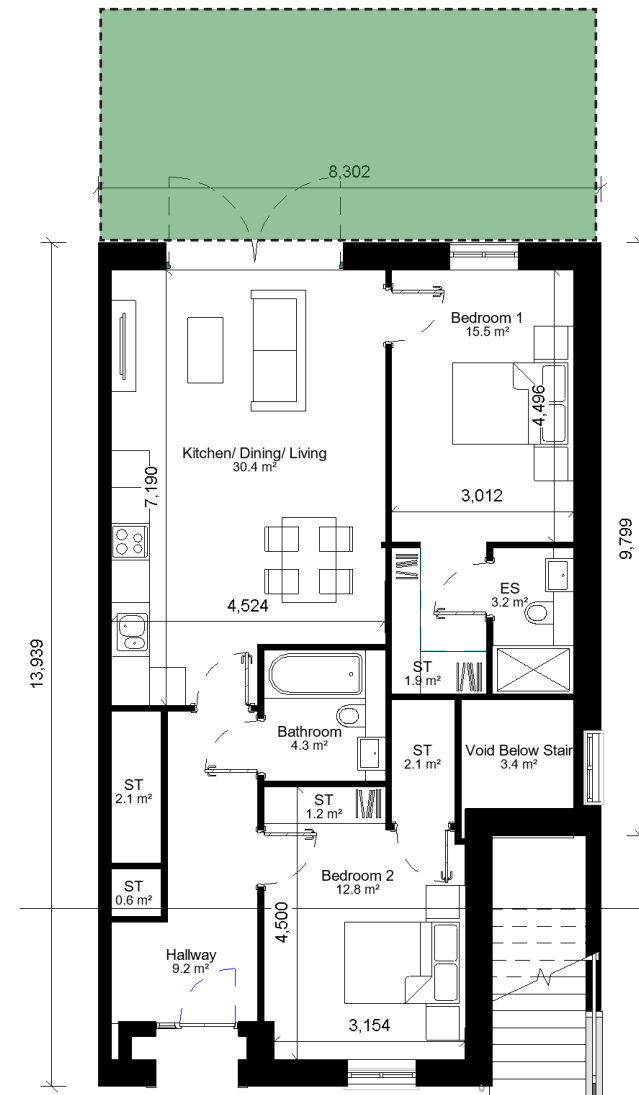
Proposed 2 Bedroom Apt Layout - Ground Floor Level - HT-05
